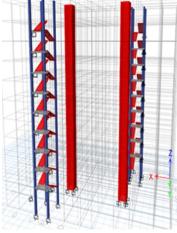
3-D View of the Whole Building, Staircase and Lift Shaft with Head Room for RCC Building
